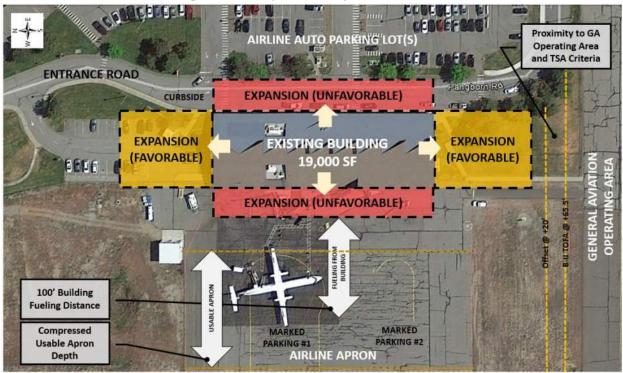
Terminal Building Exterior Expansion Capabilities
